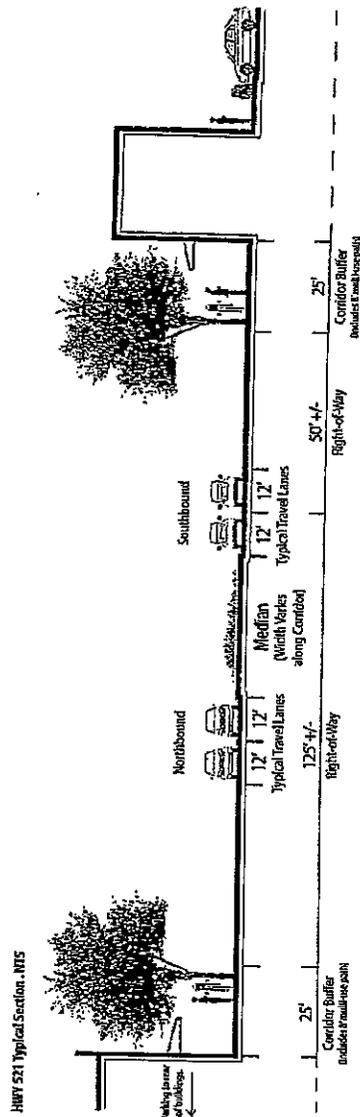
, Typical cross section along Highway Corridor Overlay District.
